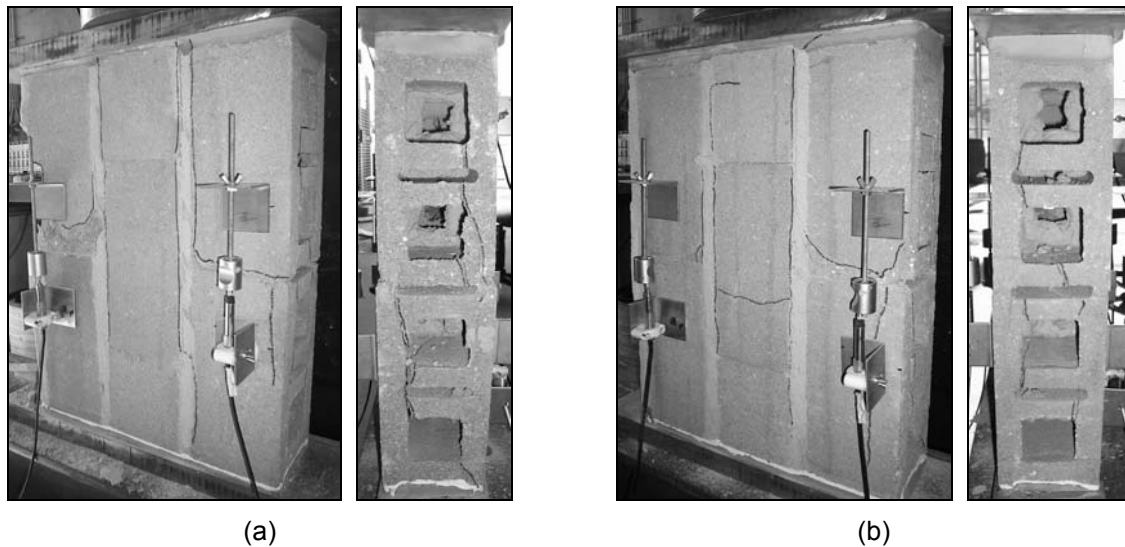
Cracking patterns of specimens built with 3C-units: (a) specimen 5 and (b) specimen 6.
